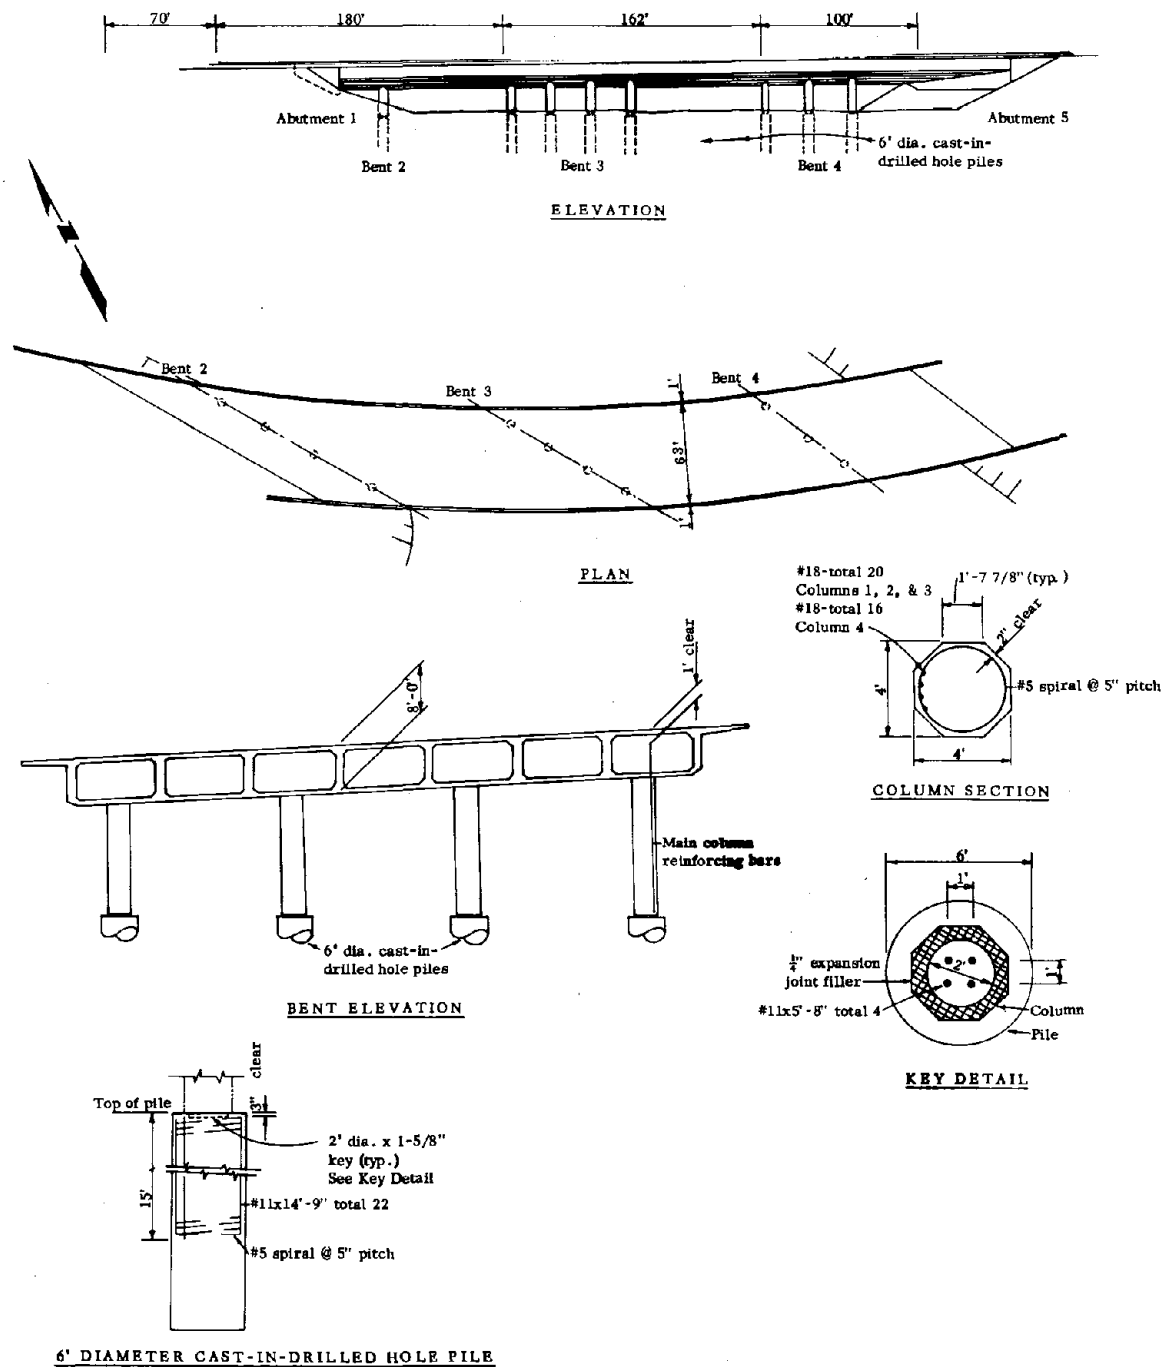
Northwest Connector Overcrossing bridge. Construction details.
